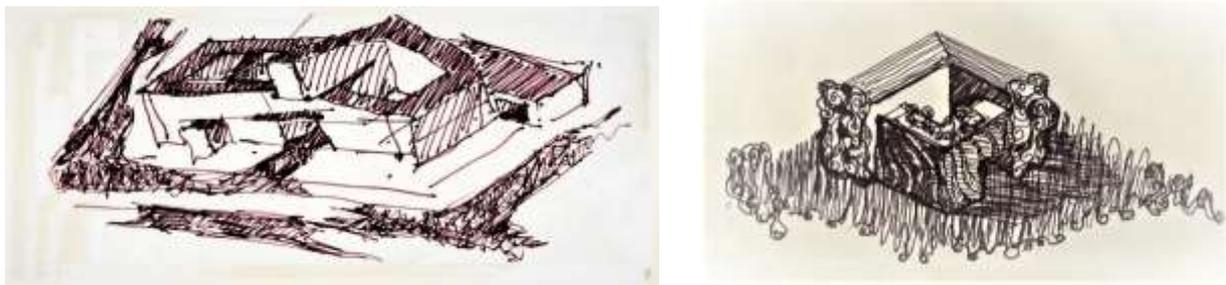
One of the first sketches, with the potential of the second stage on the extended site (3) / One of the last sketches with the actual proposed building (3)
